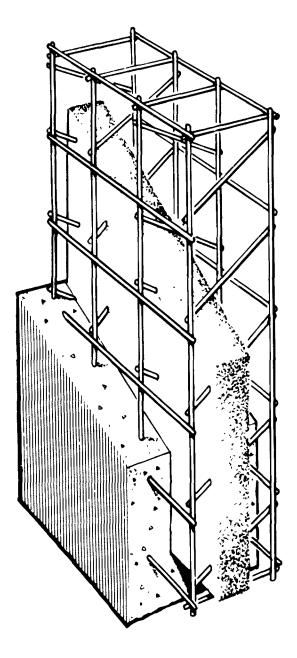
DETAIL OF W-PANEL CONSTRUCTION.
